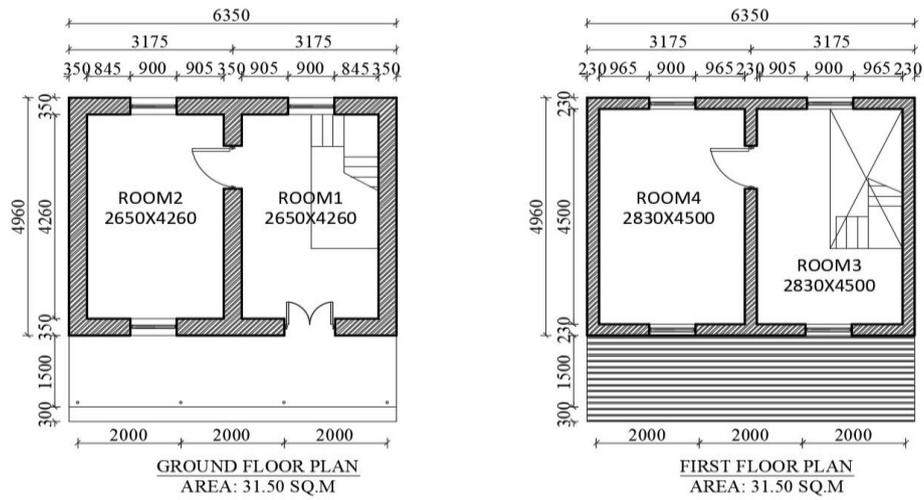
Ground floor and first floor plan BMC 2.1 LB
